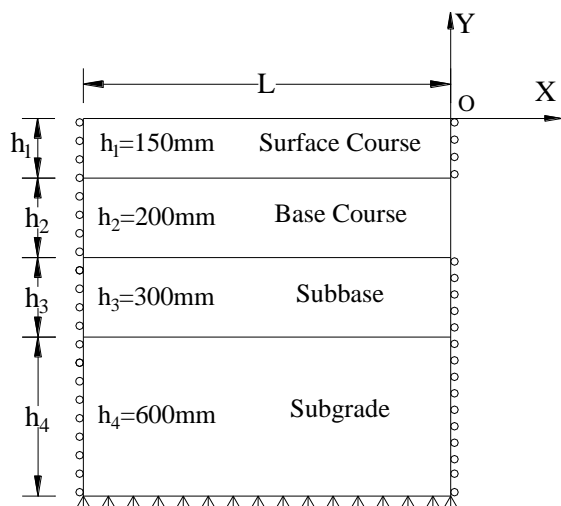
Half Pavement Structural Model (Two Dimensional).
